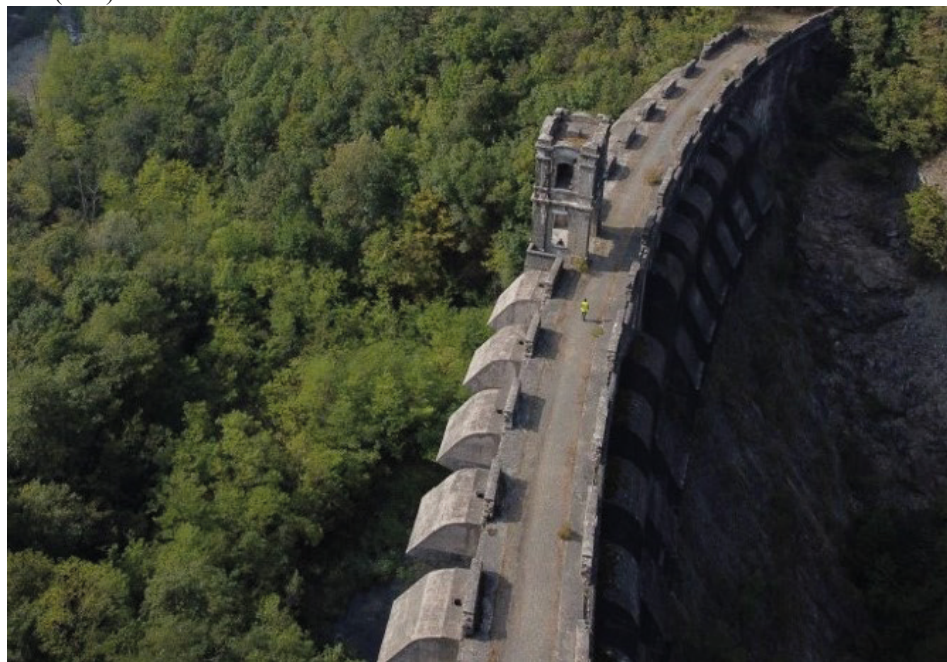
Molare Dam, detail of the architectural structure (Source: Morandi 2020)
